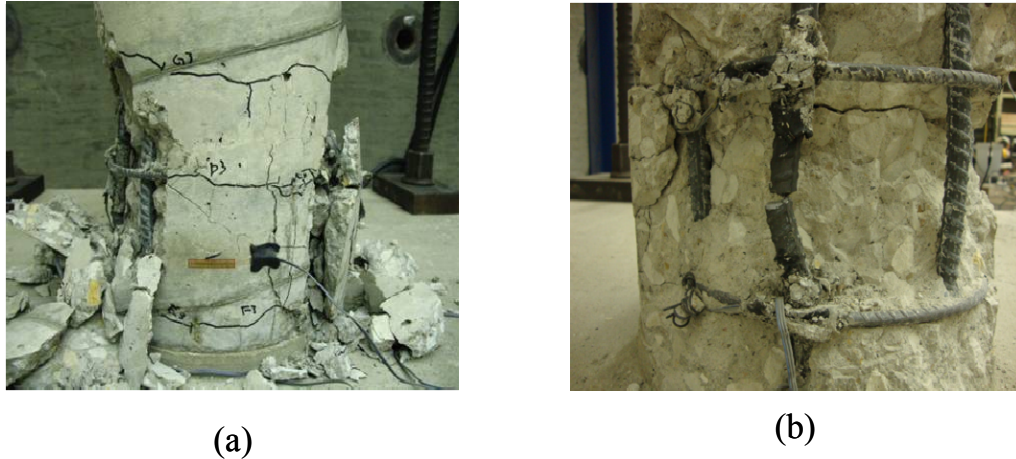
Damage of C1 column: (a) front view and (b) side view.
